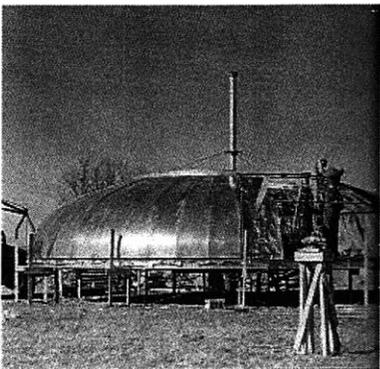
Cladding the structure with thermal foil inside, aluminum sheeting outside
